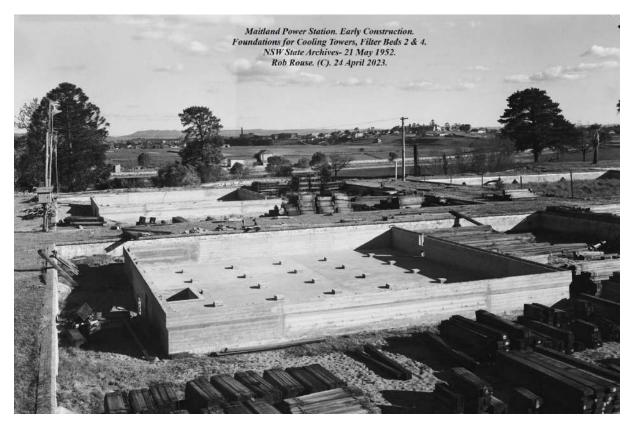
Foundations for the filter towers built over Filter Beds 2 and 4 in 1952. Photo provided by MCC.
